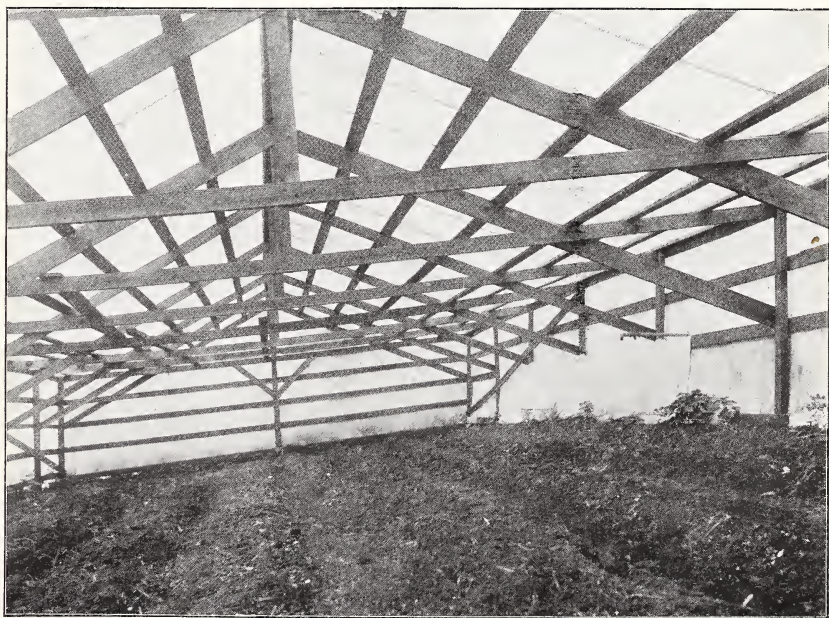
HAWAII STATION—INTERIOR OF NEW PLANT HOUSE, SHOWING CONSTRUCTION.
